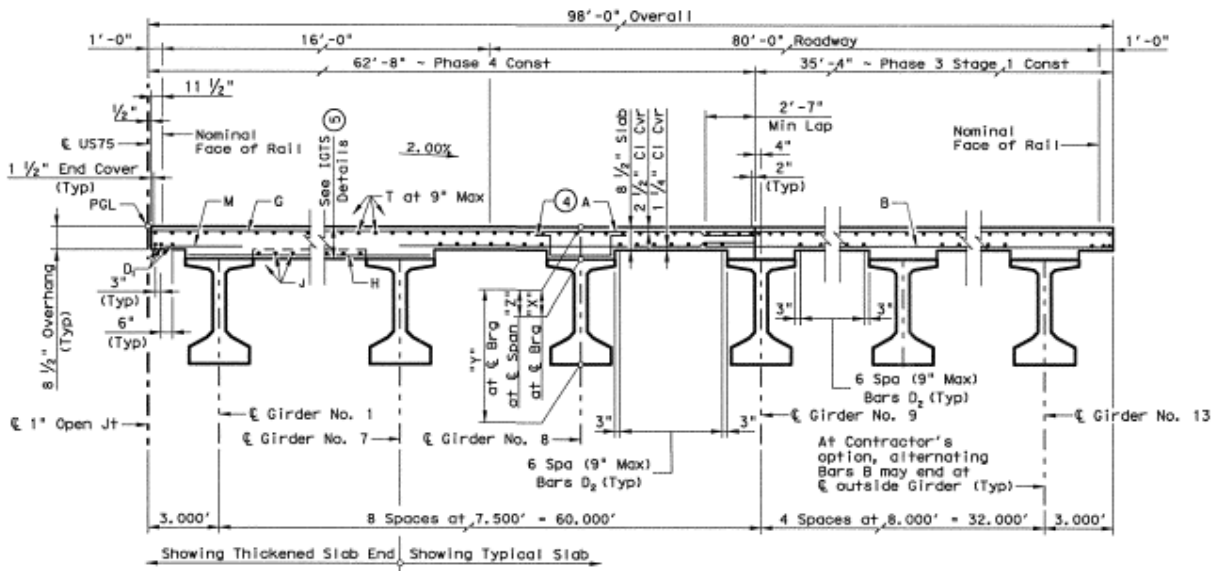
21: Typical transverse slab section of span 1 in Virginia Parkway Bridge
